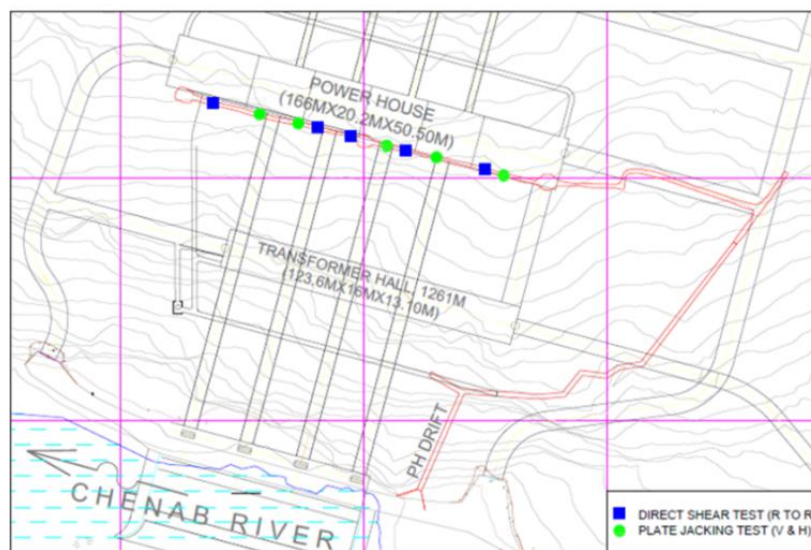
Layout plan of the powerhouse drift with locations of in-situ tests
